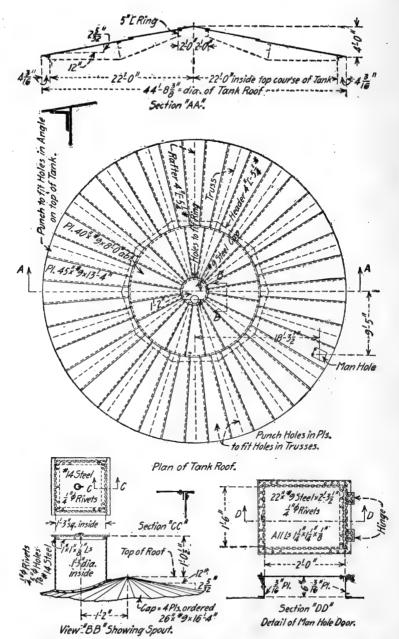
Details of Steel Roof for Steel Bins for Independent Elevator.
